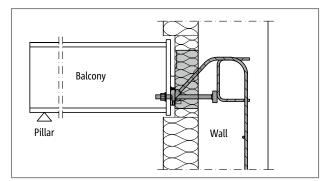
Schöck Isokorb® T Type SQ-WU: Special design; required for the connection to a reinforced concrete wall
